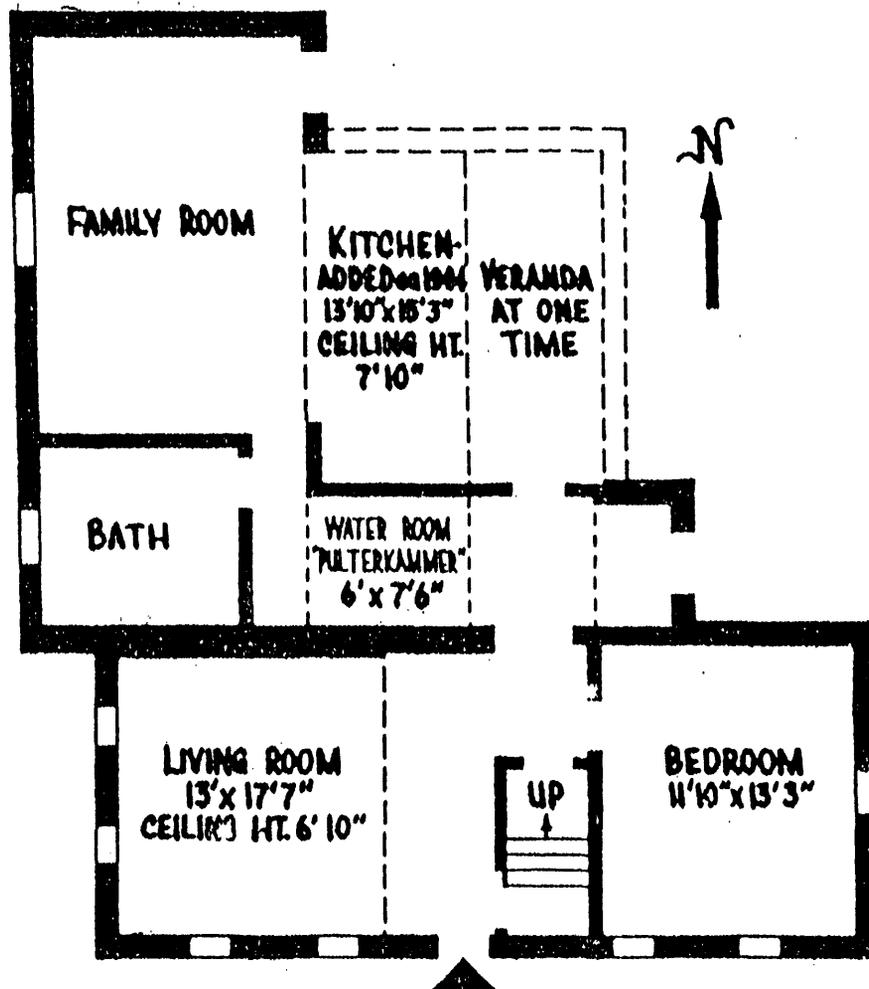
Floor Plan of Erik Simonsen House, Kimballton, Central-Passage House Type.
